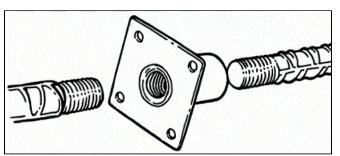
Typical threaded coupler used at construction joints. Threaded rebar or dowel is screwed into the coupler, and the flange plate is secured to the bulkhead form. When the forms have been stripped and steel is being set for the next placement of concrete, the connecting threaded bar or dowel is inserted into the coupler.
